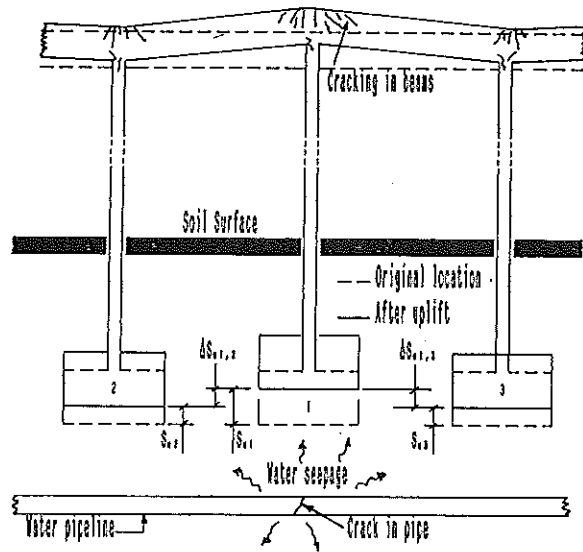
Uplift of Footings near the Location of Pipe Burst.
